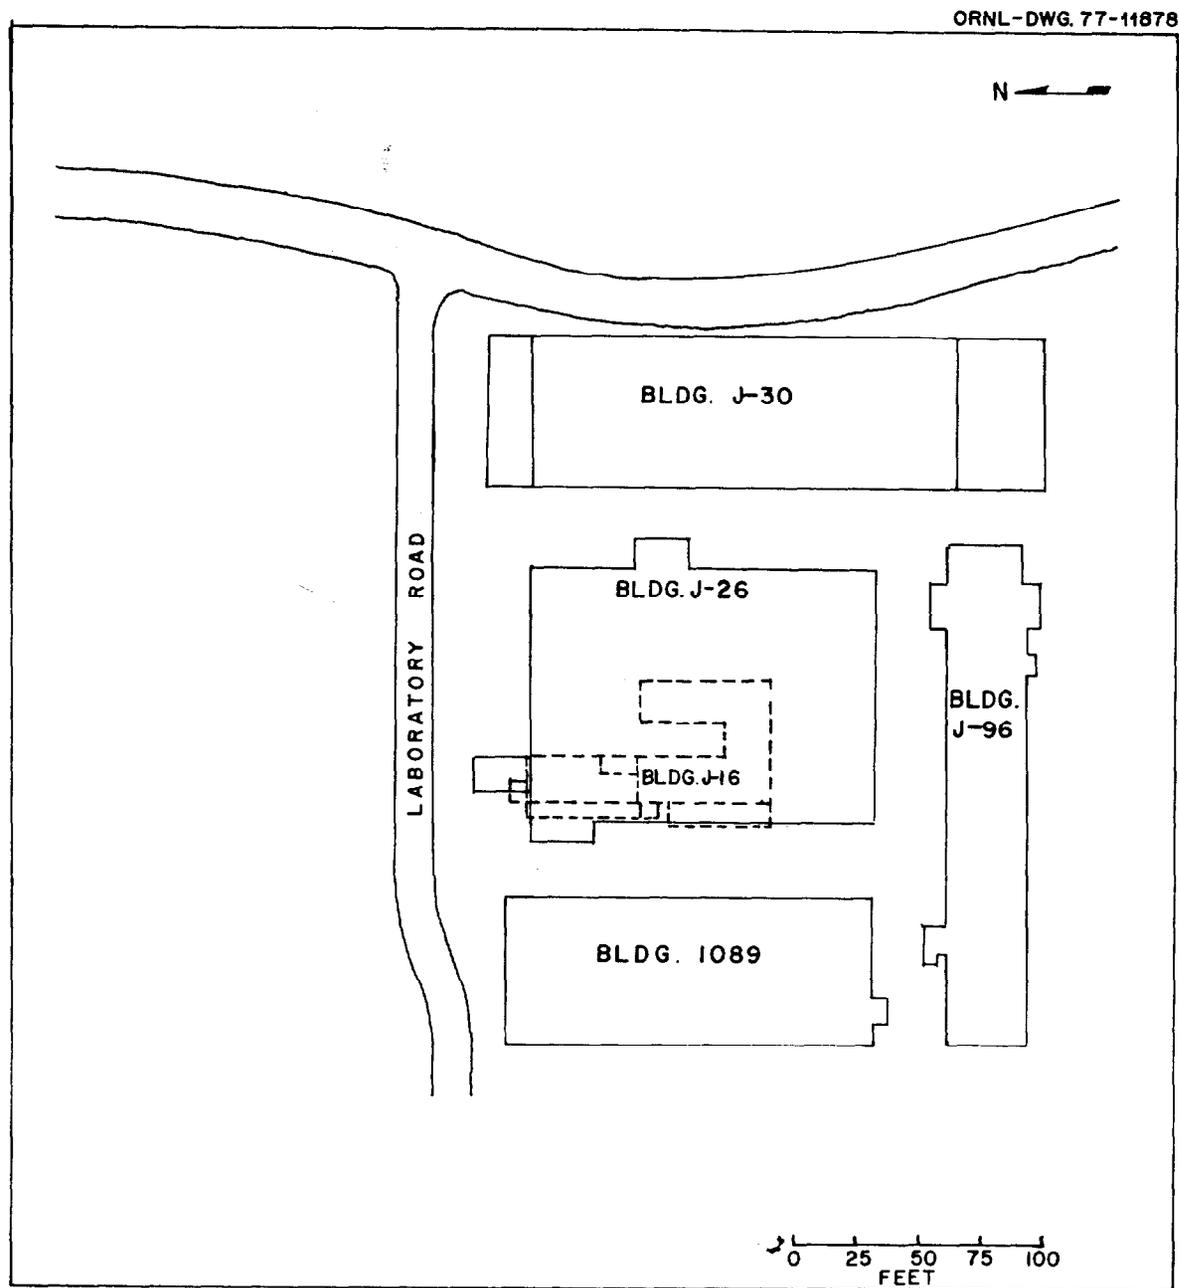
Plan view of Building J-16 (demolished) and Building J-26.
